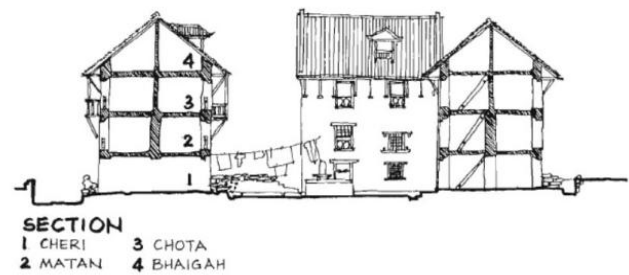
section and elevation of Newar house, source: sujanshilpakar.wordpress.com
